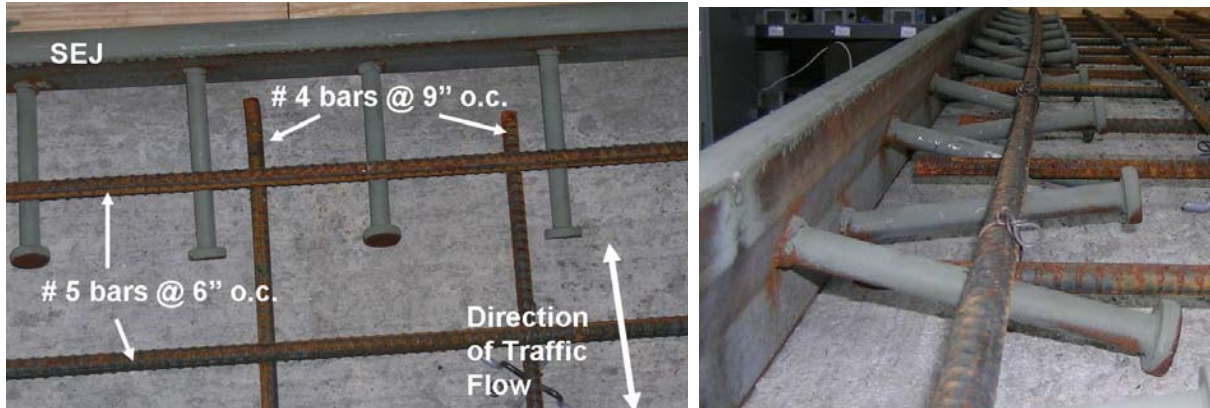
Expansion Joint and Reinforcement in Cast-in-Place Slab
